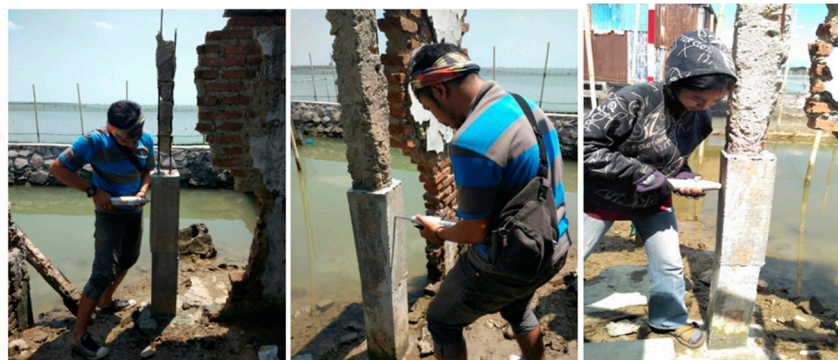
Rebound Hammer Test that was conducted on the retrofitted columns at 12, 13, and 14 months.
